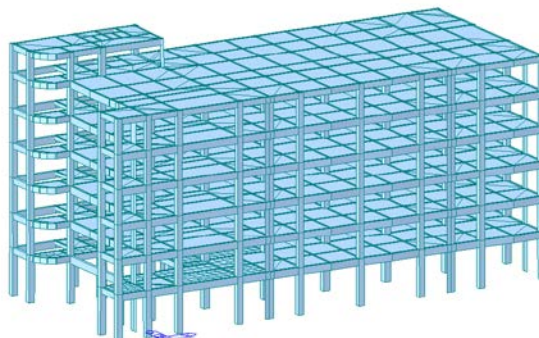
MIDAS structural model after placing the equivalent shear wall-piers
